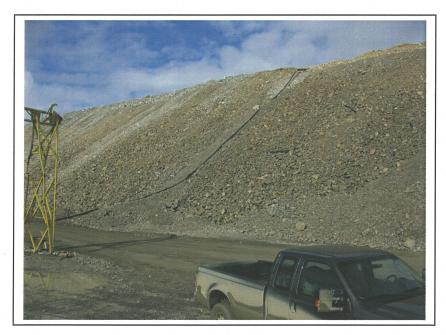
Main Embankment Seepage Pond Return Pipe
